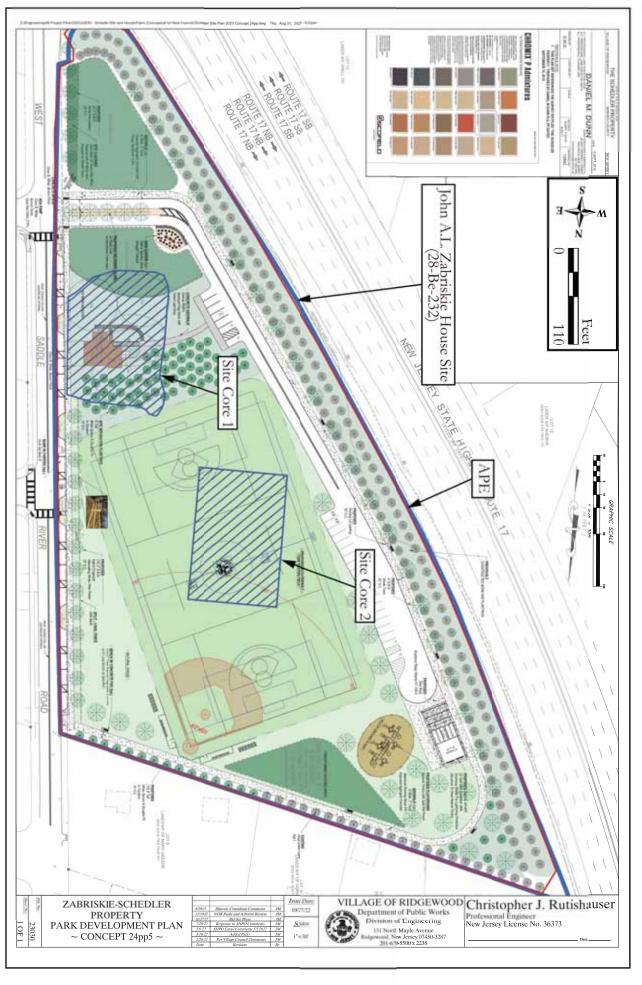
Zabriskie-Schedler Property Park Development Plan showing the John A.L. Zabriskie House Site (28-Be-232).
